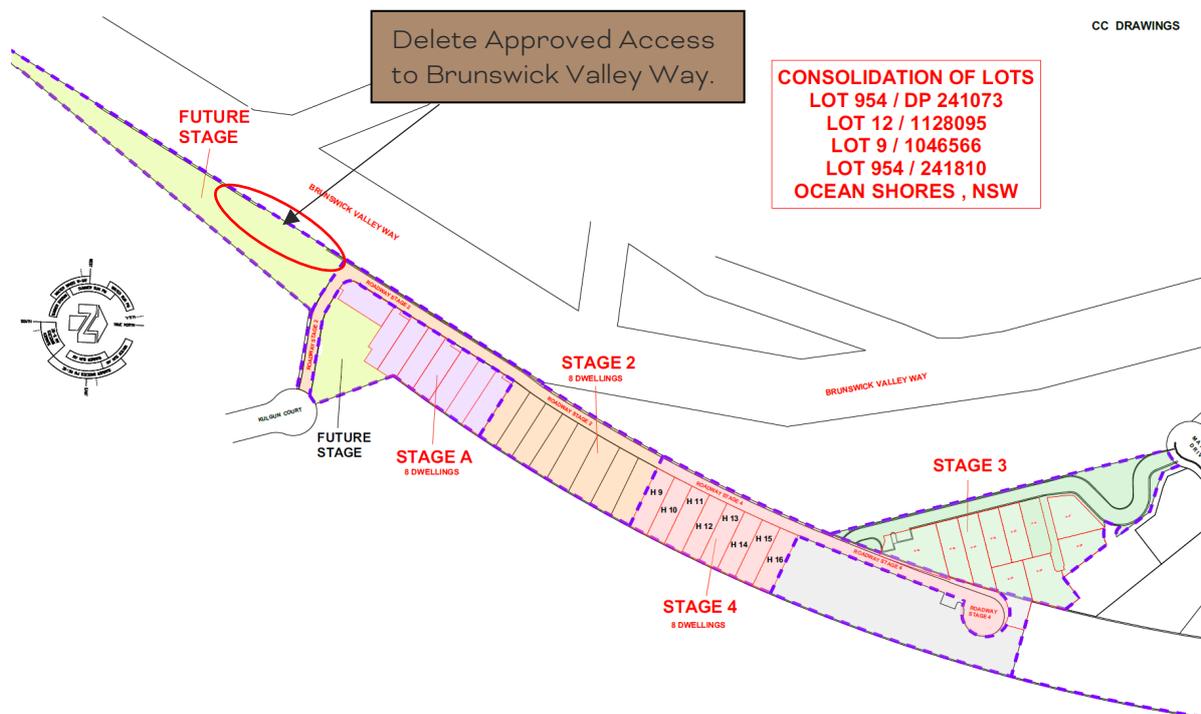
Staging Plan Extract | Brunswick Valley Way Access Delete
